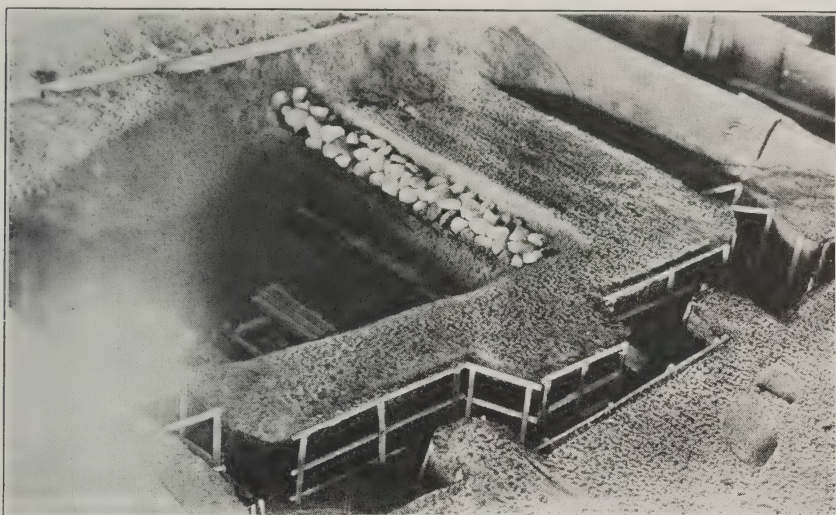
Dressing Station. "Cut-and-cover" roof. Cover: 6" earth, 18" rock, 2' earth; steel rails, 2' earth, layer heavy timber.
